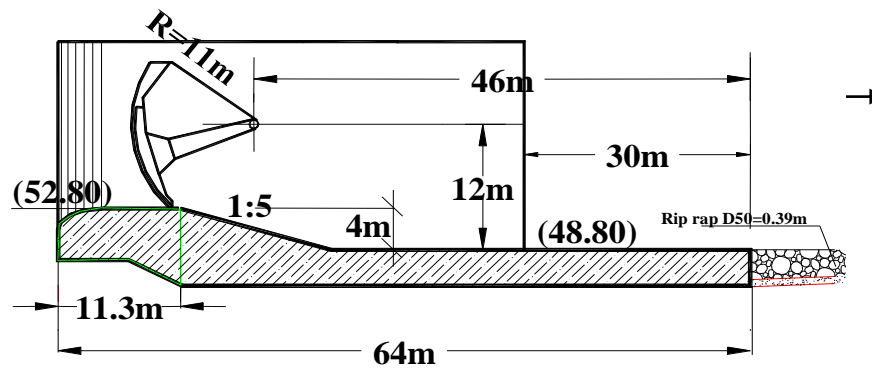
Longitudinal Section of the New Naga Hammadi Spillway Stilling Basin, Lahmeyer (1997)
